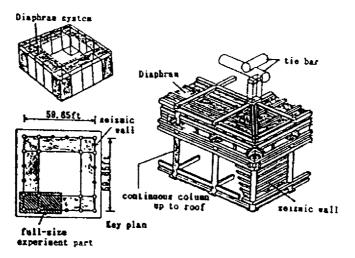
Structural outline of a traditional wooden temple hall recently constructed[4]
